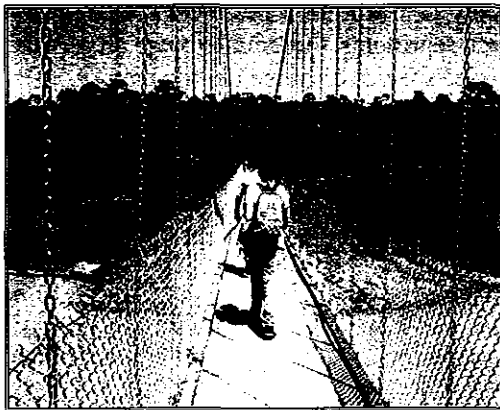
and 4.26 Partial View of the Carolina Hanging Bridge
